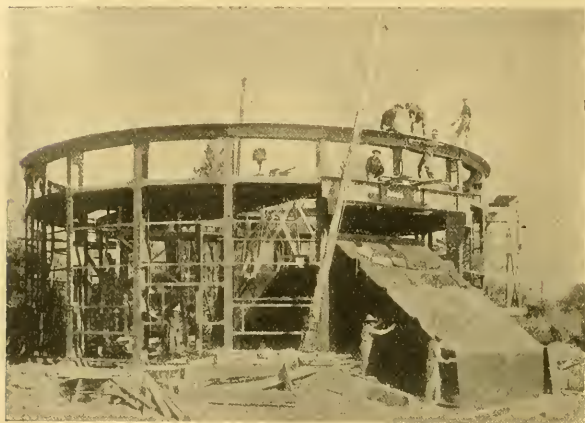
Steel Building for 60-inch Reflector, Mount Wilson Solar Observatory.
